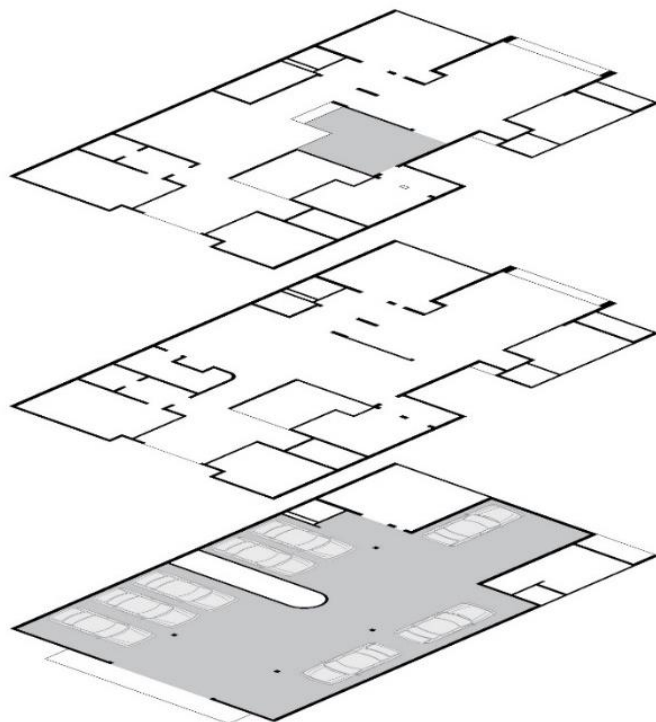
, Mir Hosseini case study, ground, 1st and 2nd floor, drawing by author
